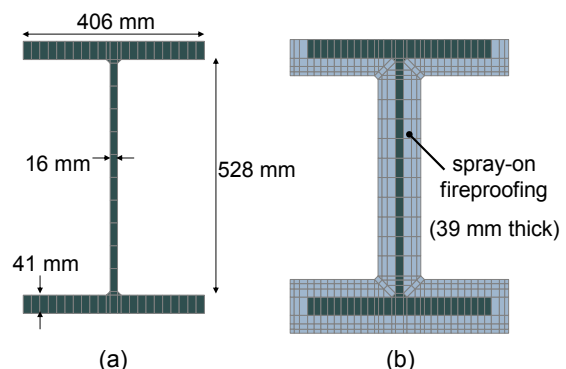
Cross-section of the beam used in this study, shown (a) unprotected and (b) protected by fireproofing (shown with finite-element discretization).
